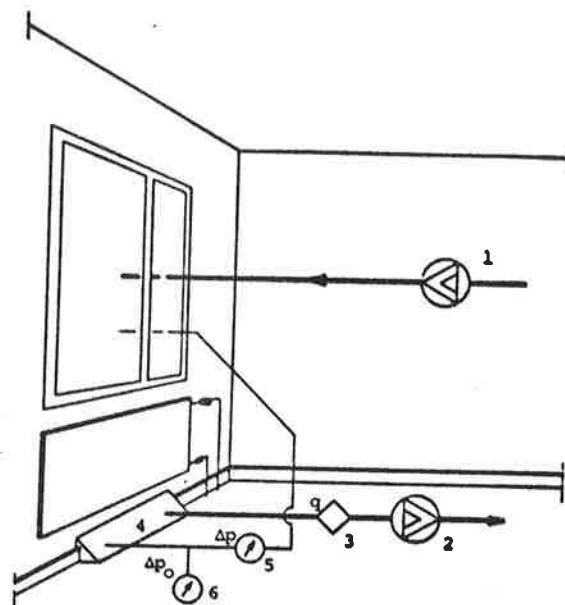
Measurement of a specific air leak of the joint between outer wall and floor.
